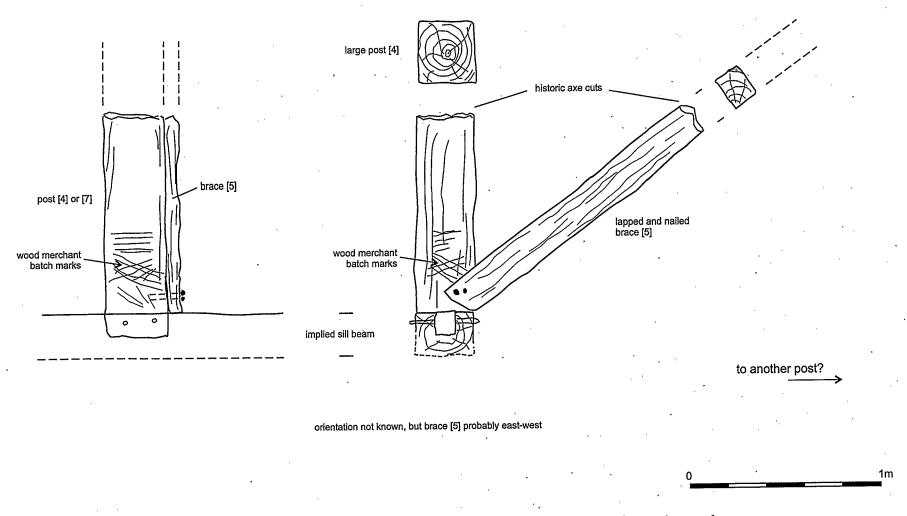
Reconstructed elevation of refitting timbers, forming 'Assembly B': a substantial post and diagonal cross-brace (probably oriented at right angles to Fig 8)
